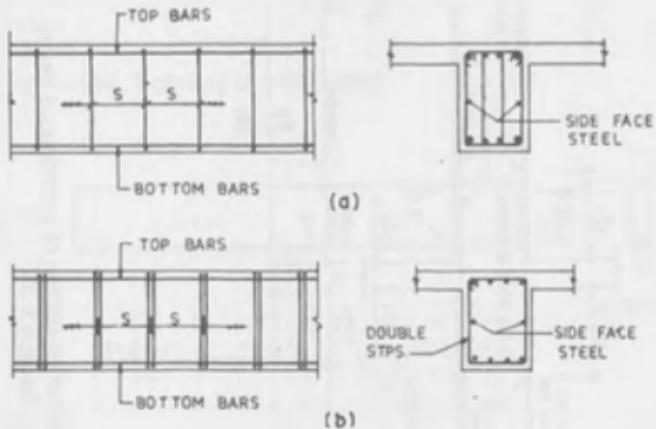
14. 4-Legged Stirrups and 2-Legged double stirrups. (a) 4-legged stirrups at spacing 'S'; (b) 2-legged double stirrups at spacing 'S'.
